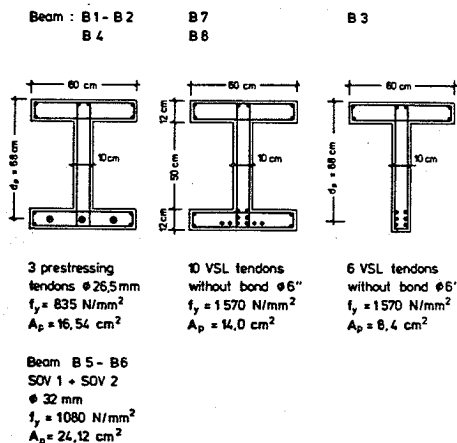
Cross sections and prestressing reinforcement of the test beams.
